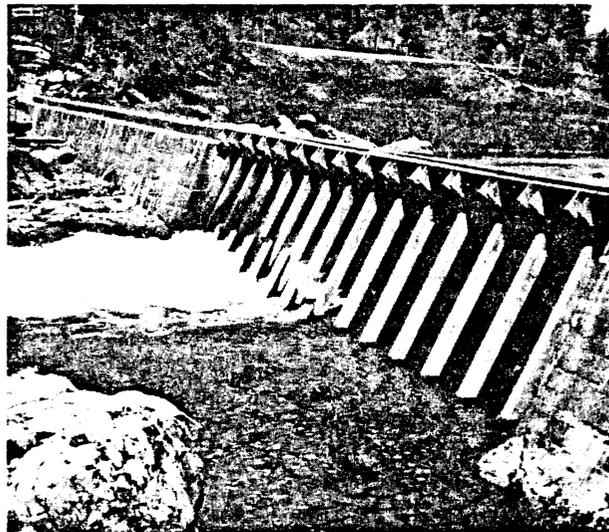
Unusual structure which combines concrete gravity abutment segments with central timber slab and buttress segment
